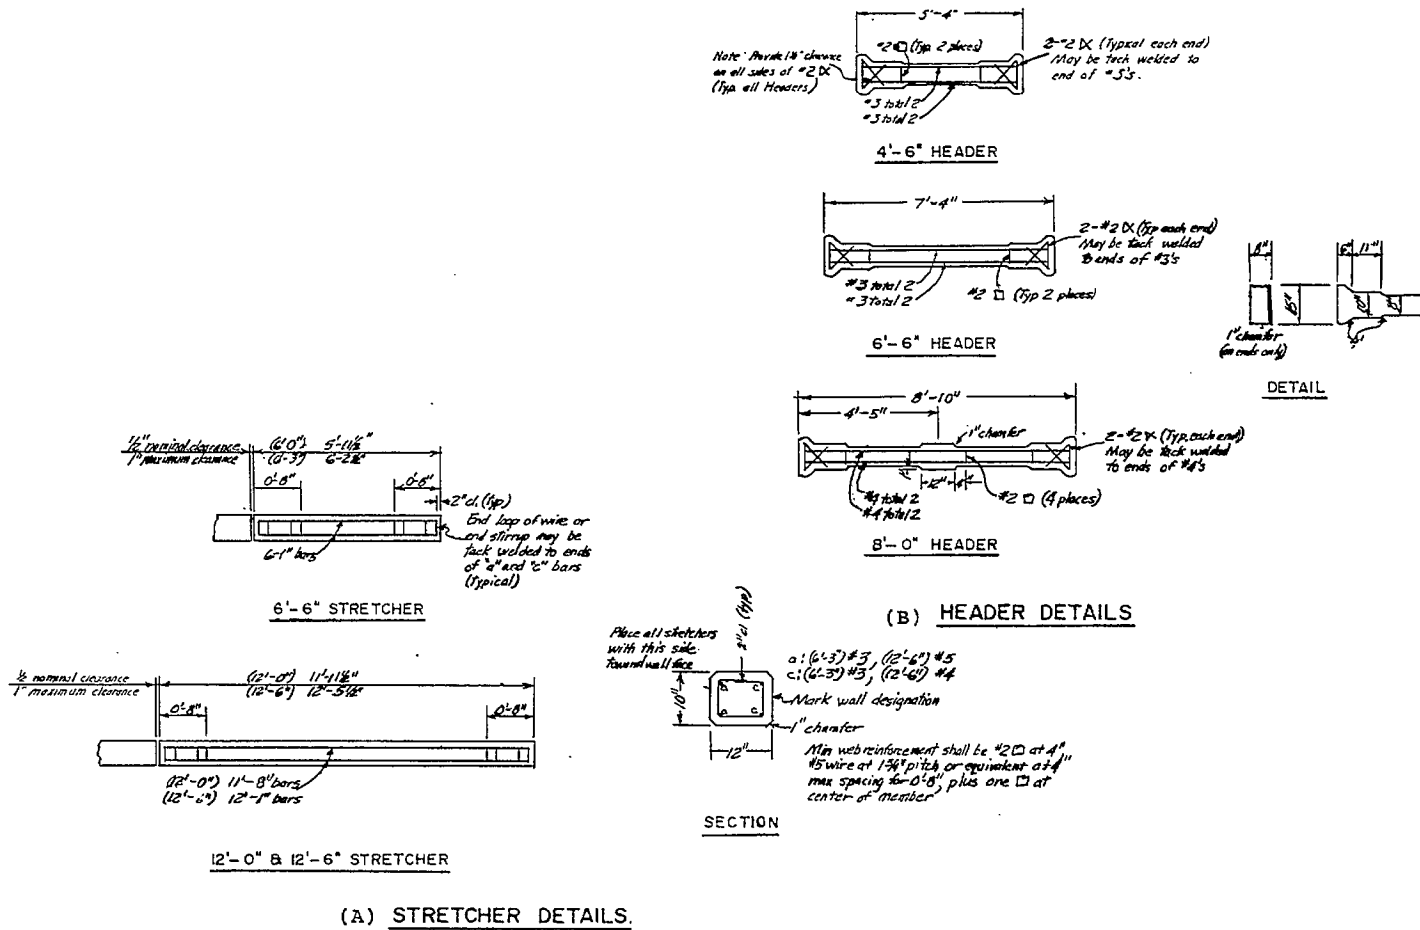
Detail of concrete crib members - U.S. Department of Transport (16).
